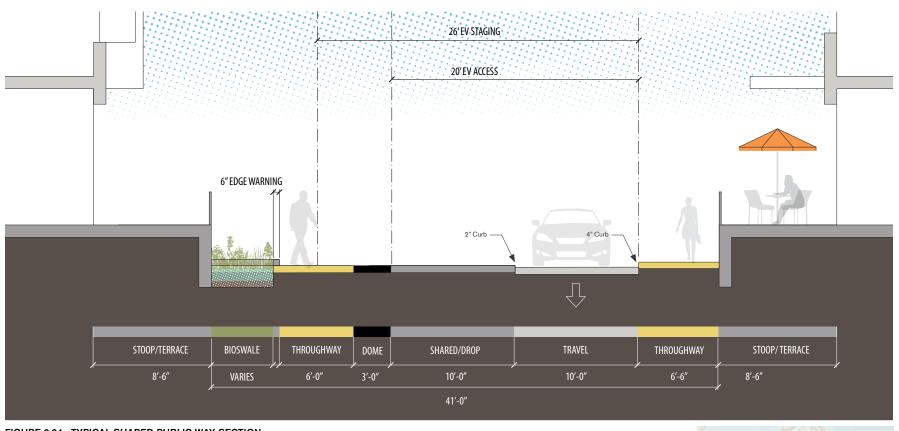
TYPICAL SHARED PUBLIC WAY SECTION
